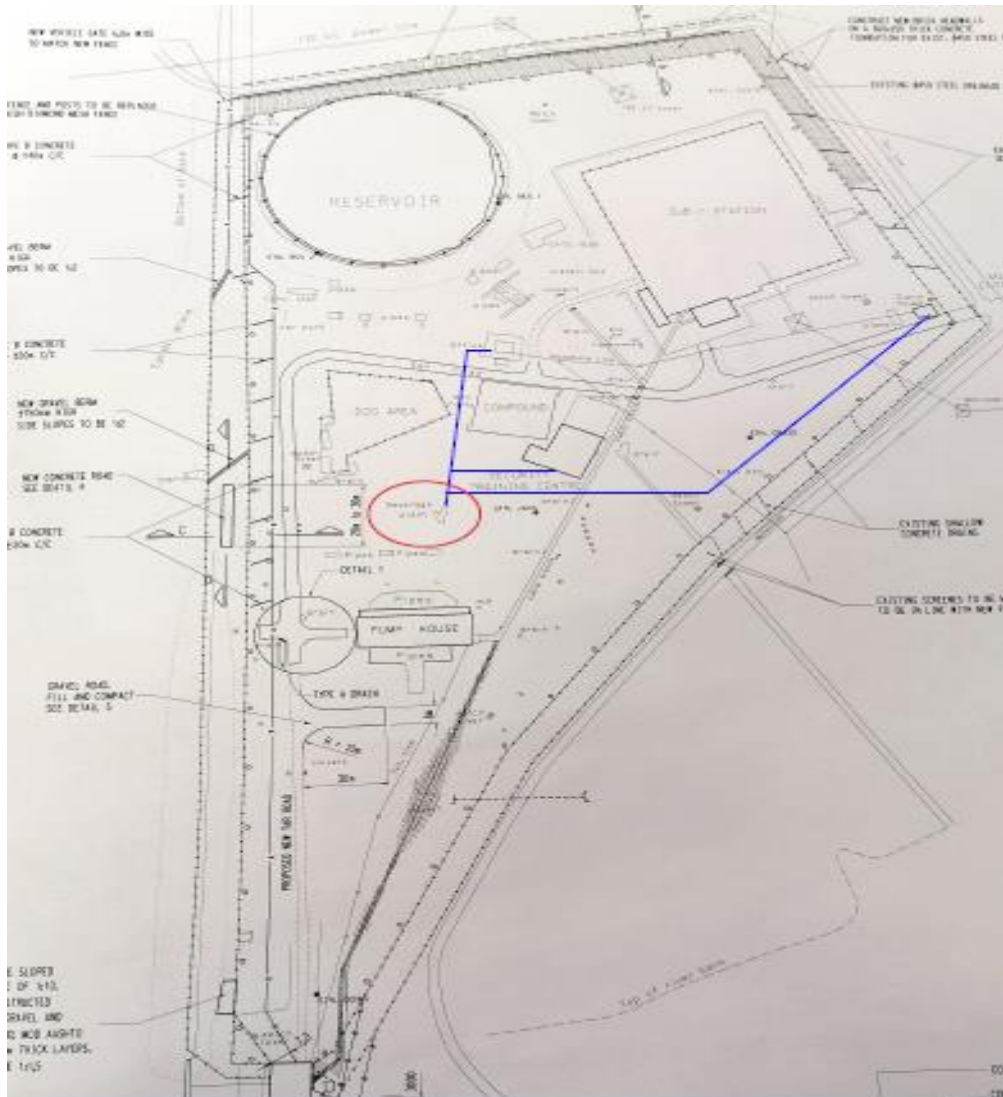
Bosloop plant layout showing the flow of sewage from the ablution facilities to the sewage plant.
